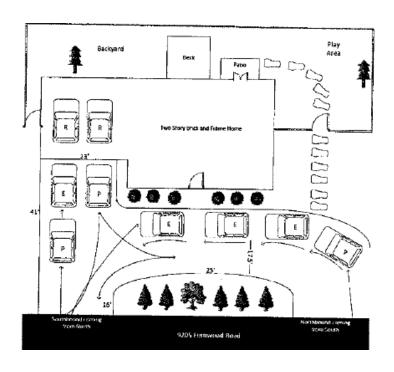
Applicant's Initial submittal for Vehicular Circulation and Parking Plan (not to scale)
